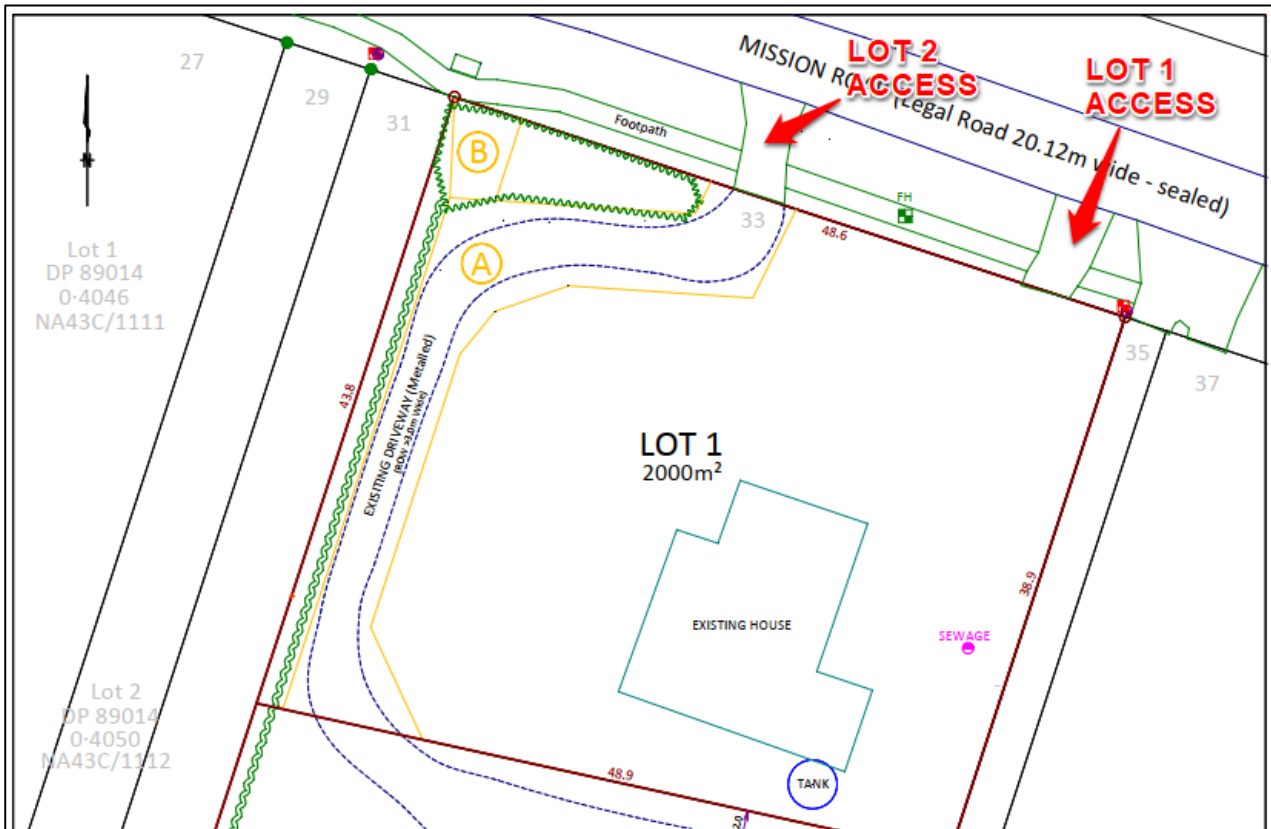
Snip of Scheme Plan showing existing & proposed access locations.
